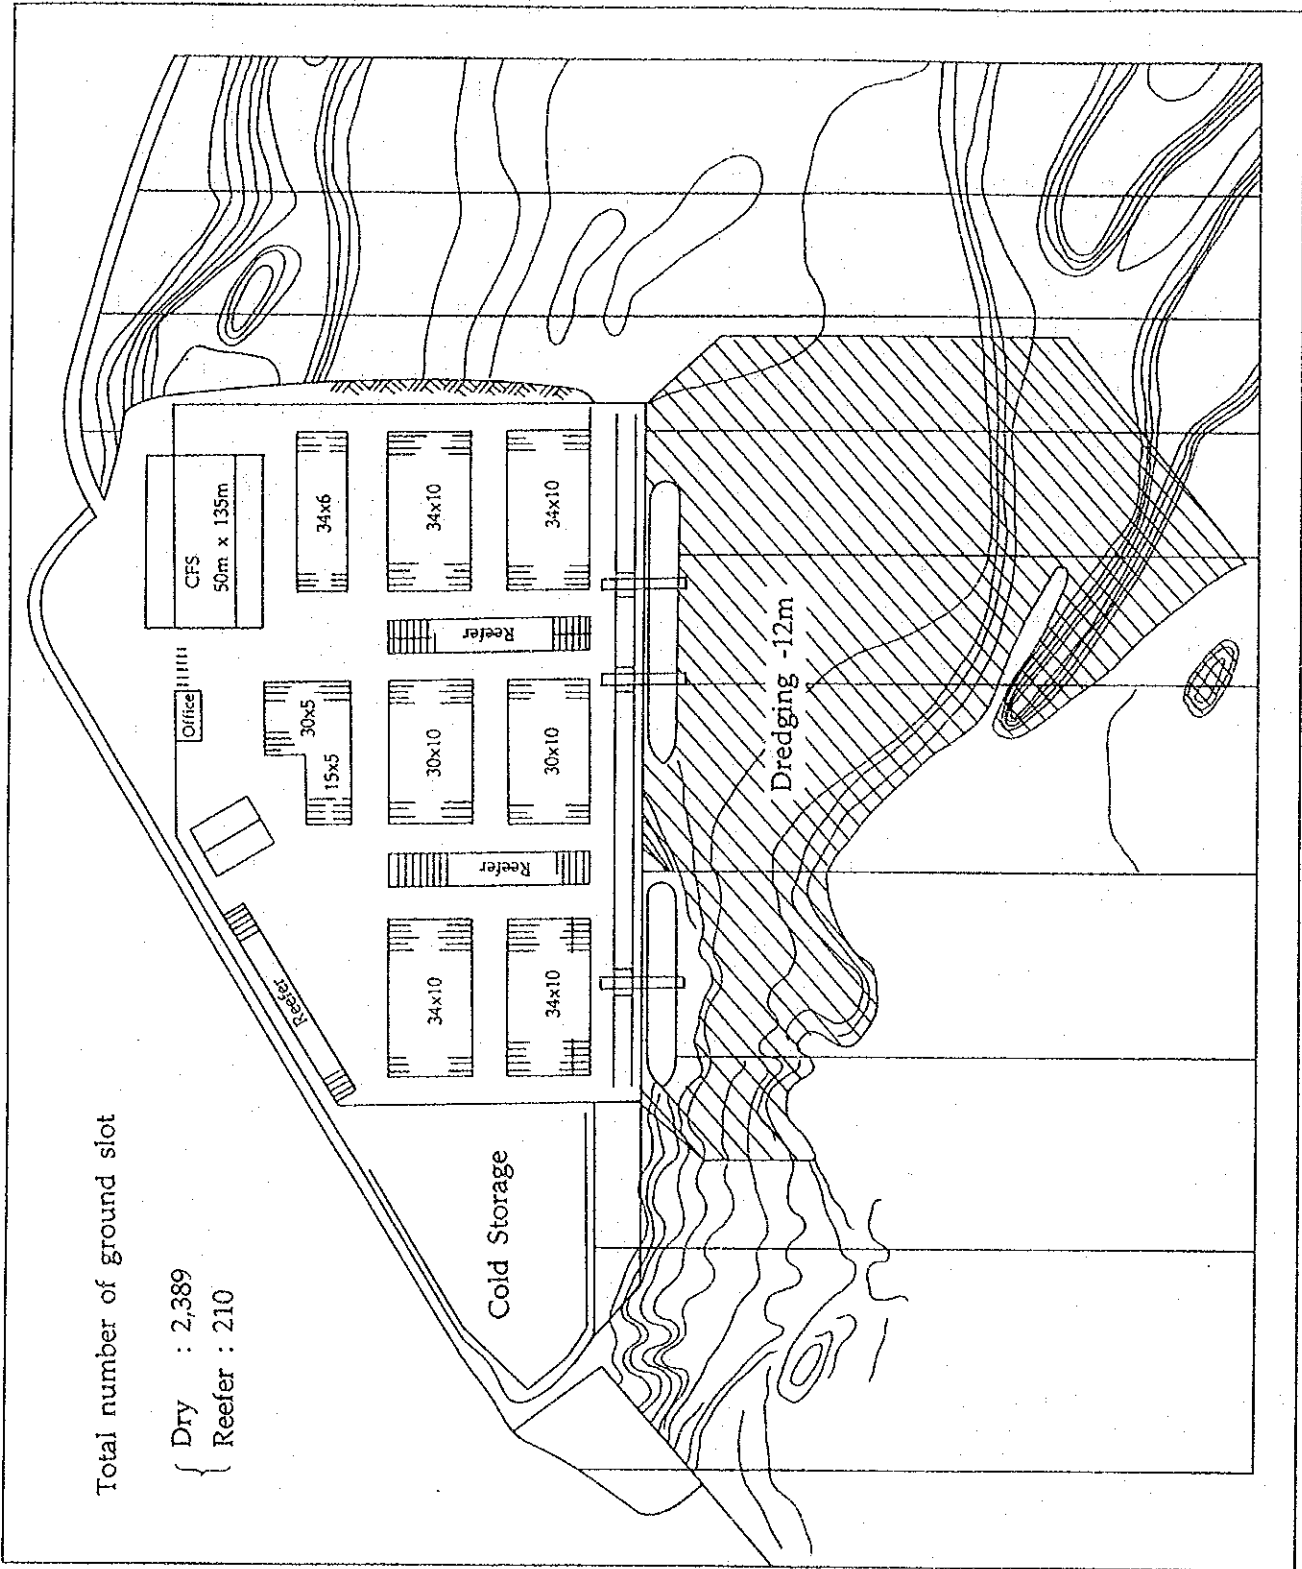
Lay-out Plan of Alternative 1-1
